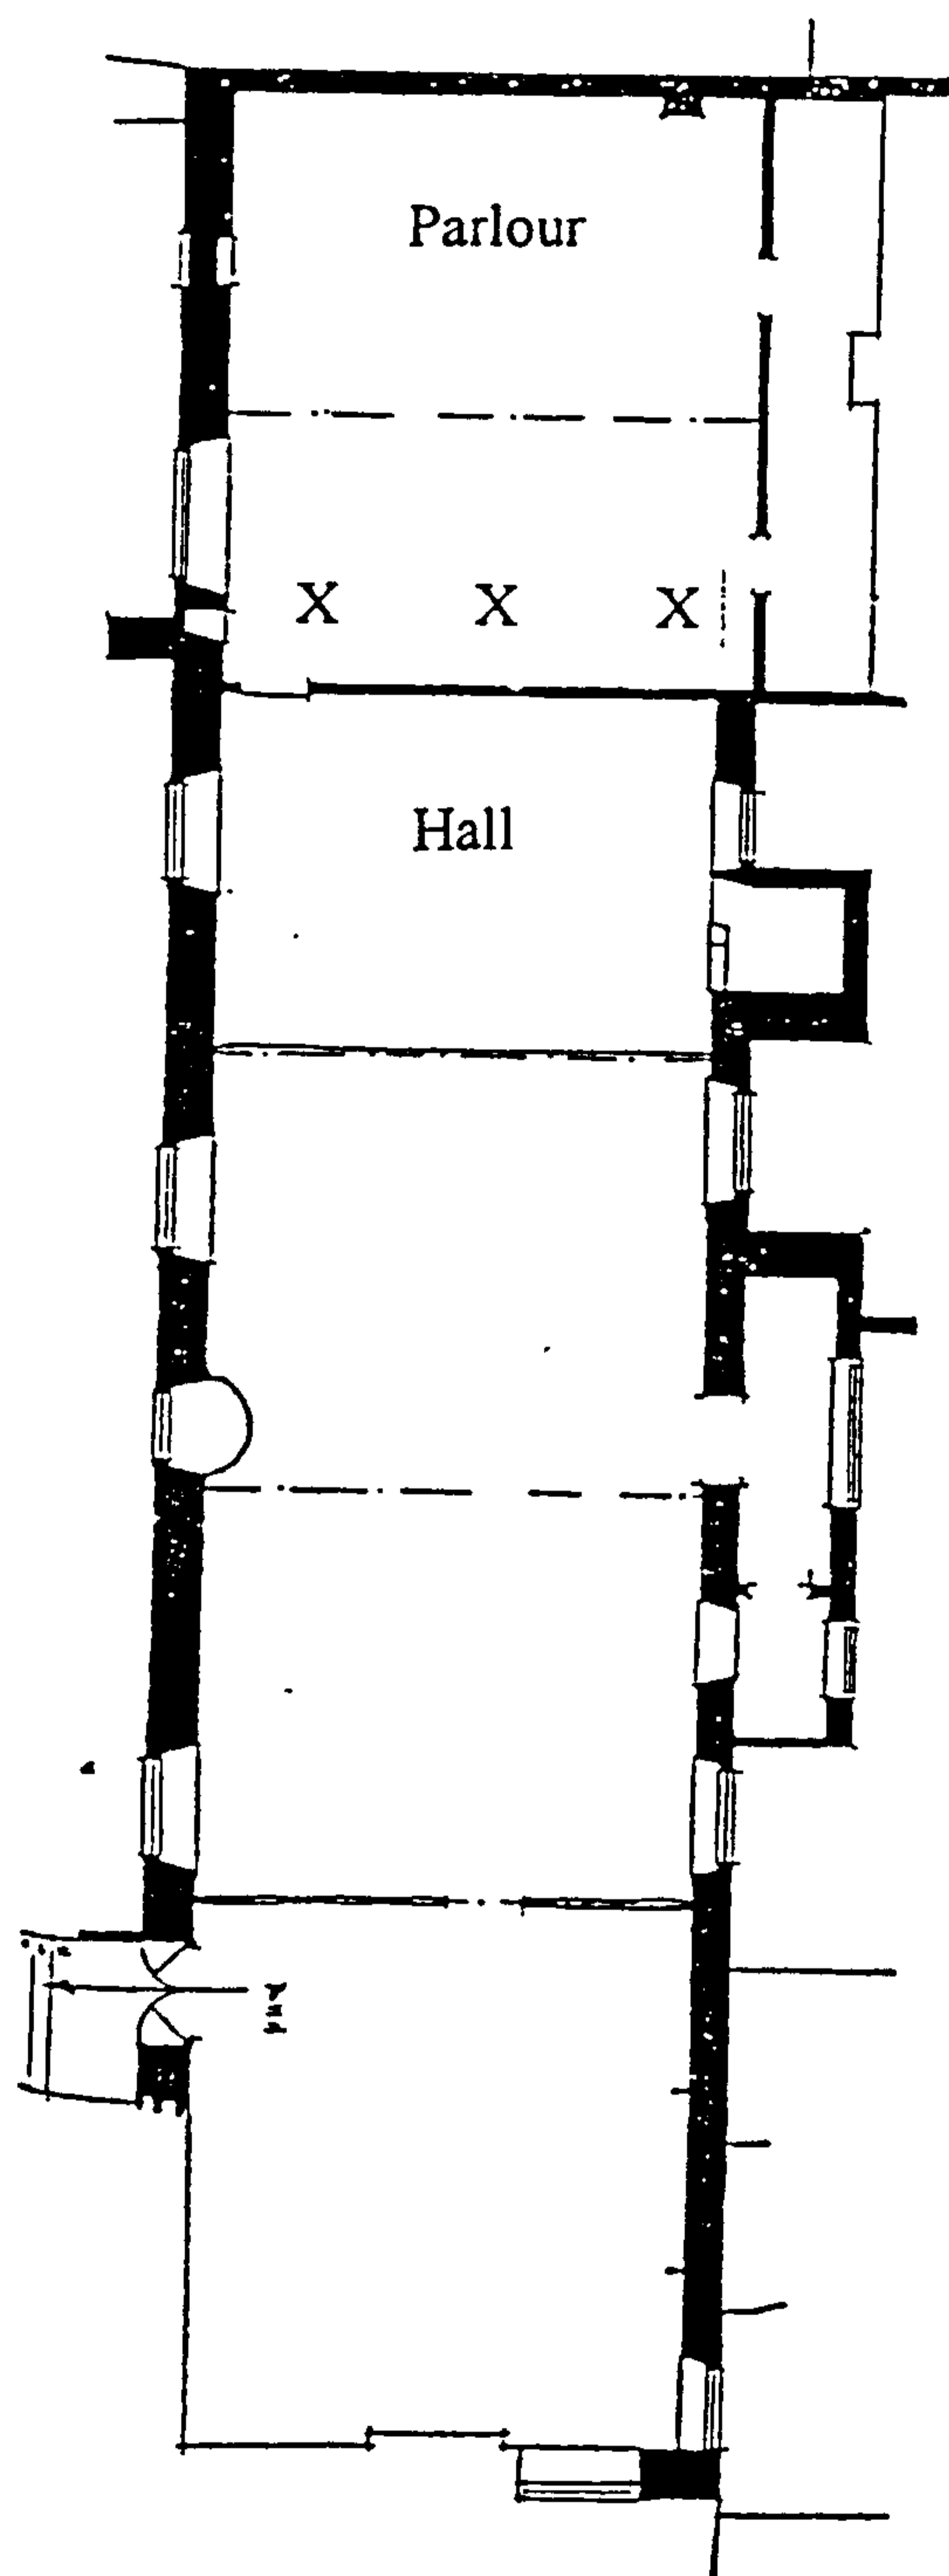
Chichester, Vicars' Hall. Plan of interior of building, sampled areas marked (X).
